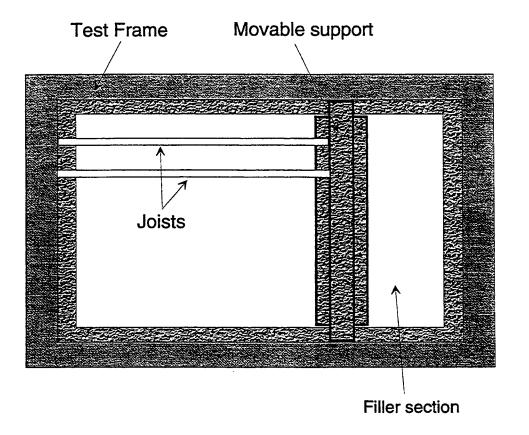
Illustration of the use of the movable concrete support when testing floors with different joist lengths.
